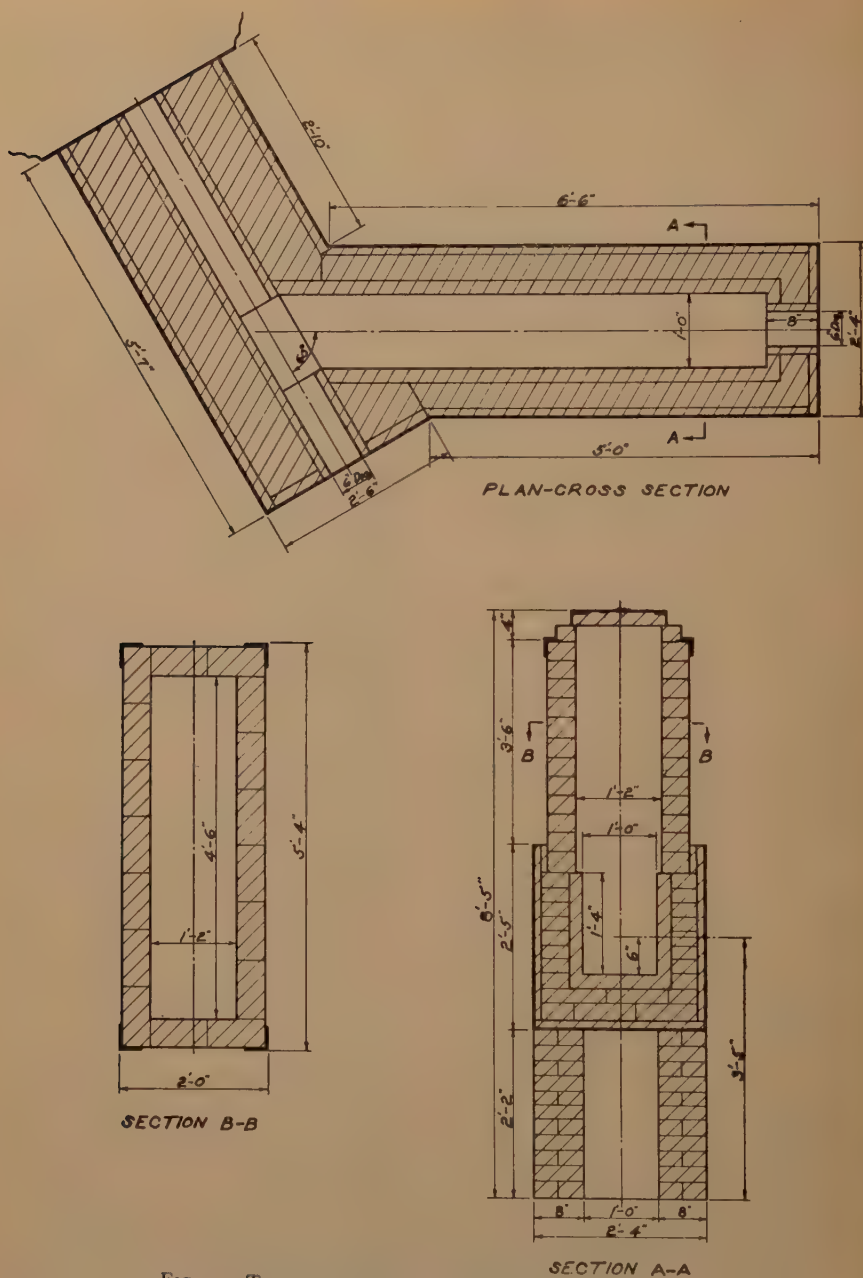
THE CONDENSER; PLAN AND CROSS SECTIONS.
